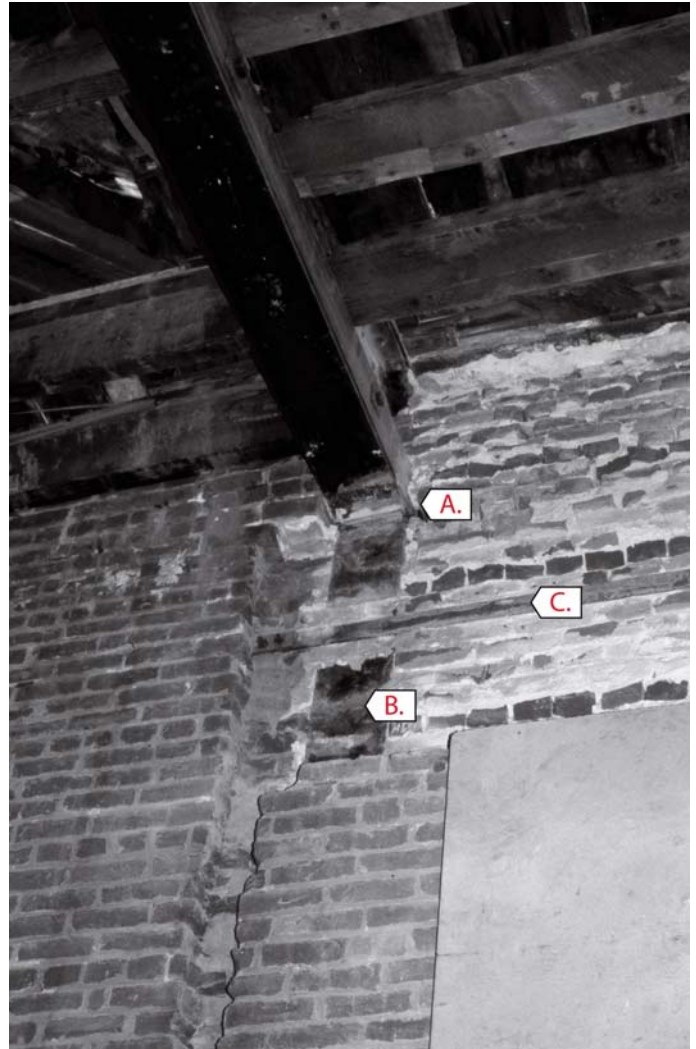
South Hall wall in demolition. Iron T-shaped columns (B) hold up girders (A) with bond iron in outside walls. Note one row of bricks has been removed.
